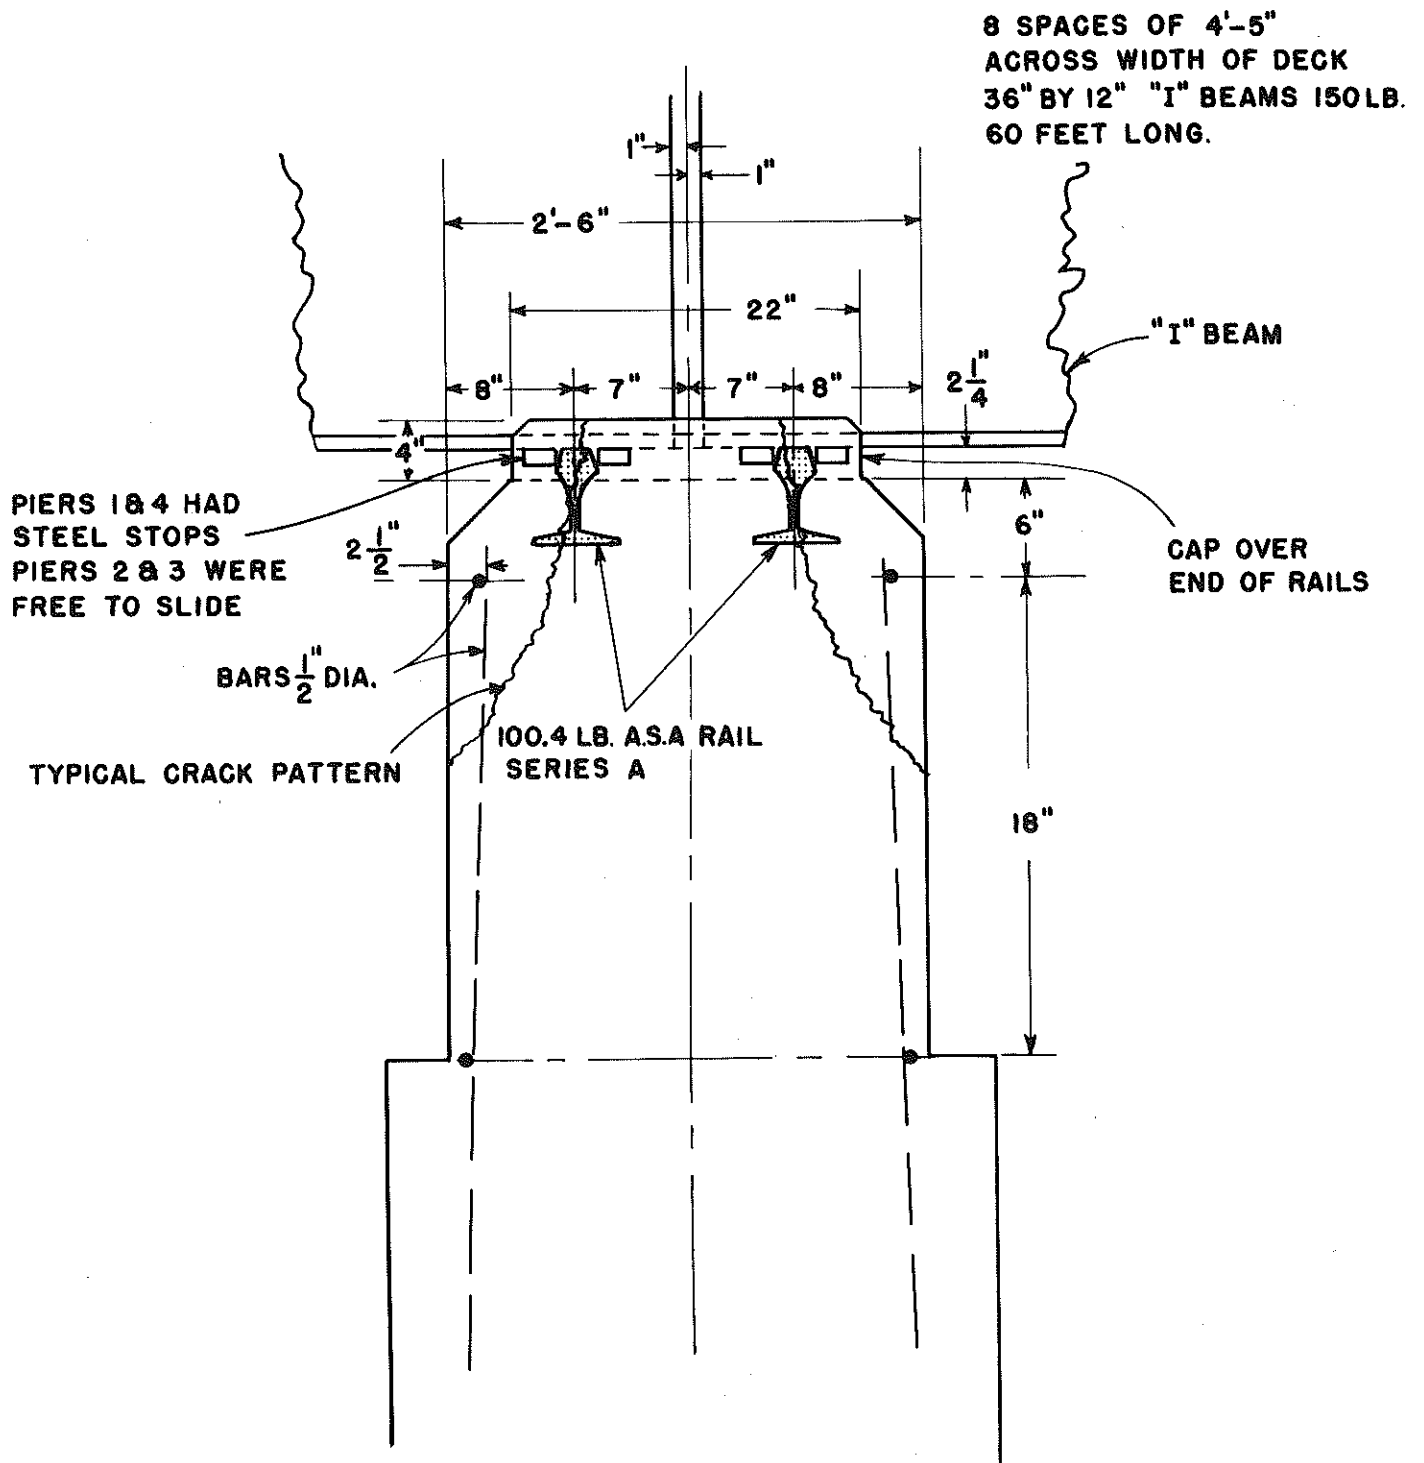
CROSS SECTION OF ALL FOUR PIERS SHOWING LOCATION OF 100 LB. RAIL IN PIER TOP FOR BEARING LOAD OF BRIDGE DECK.
